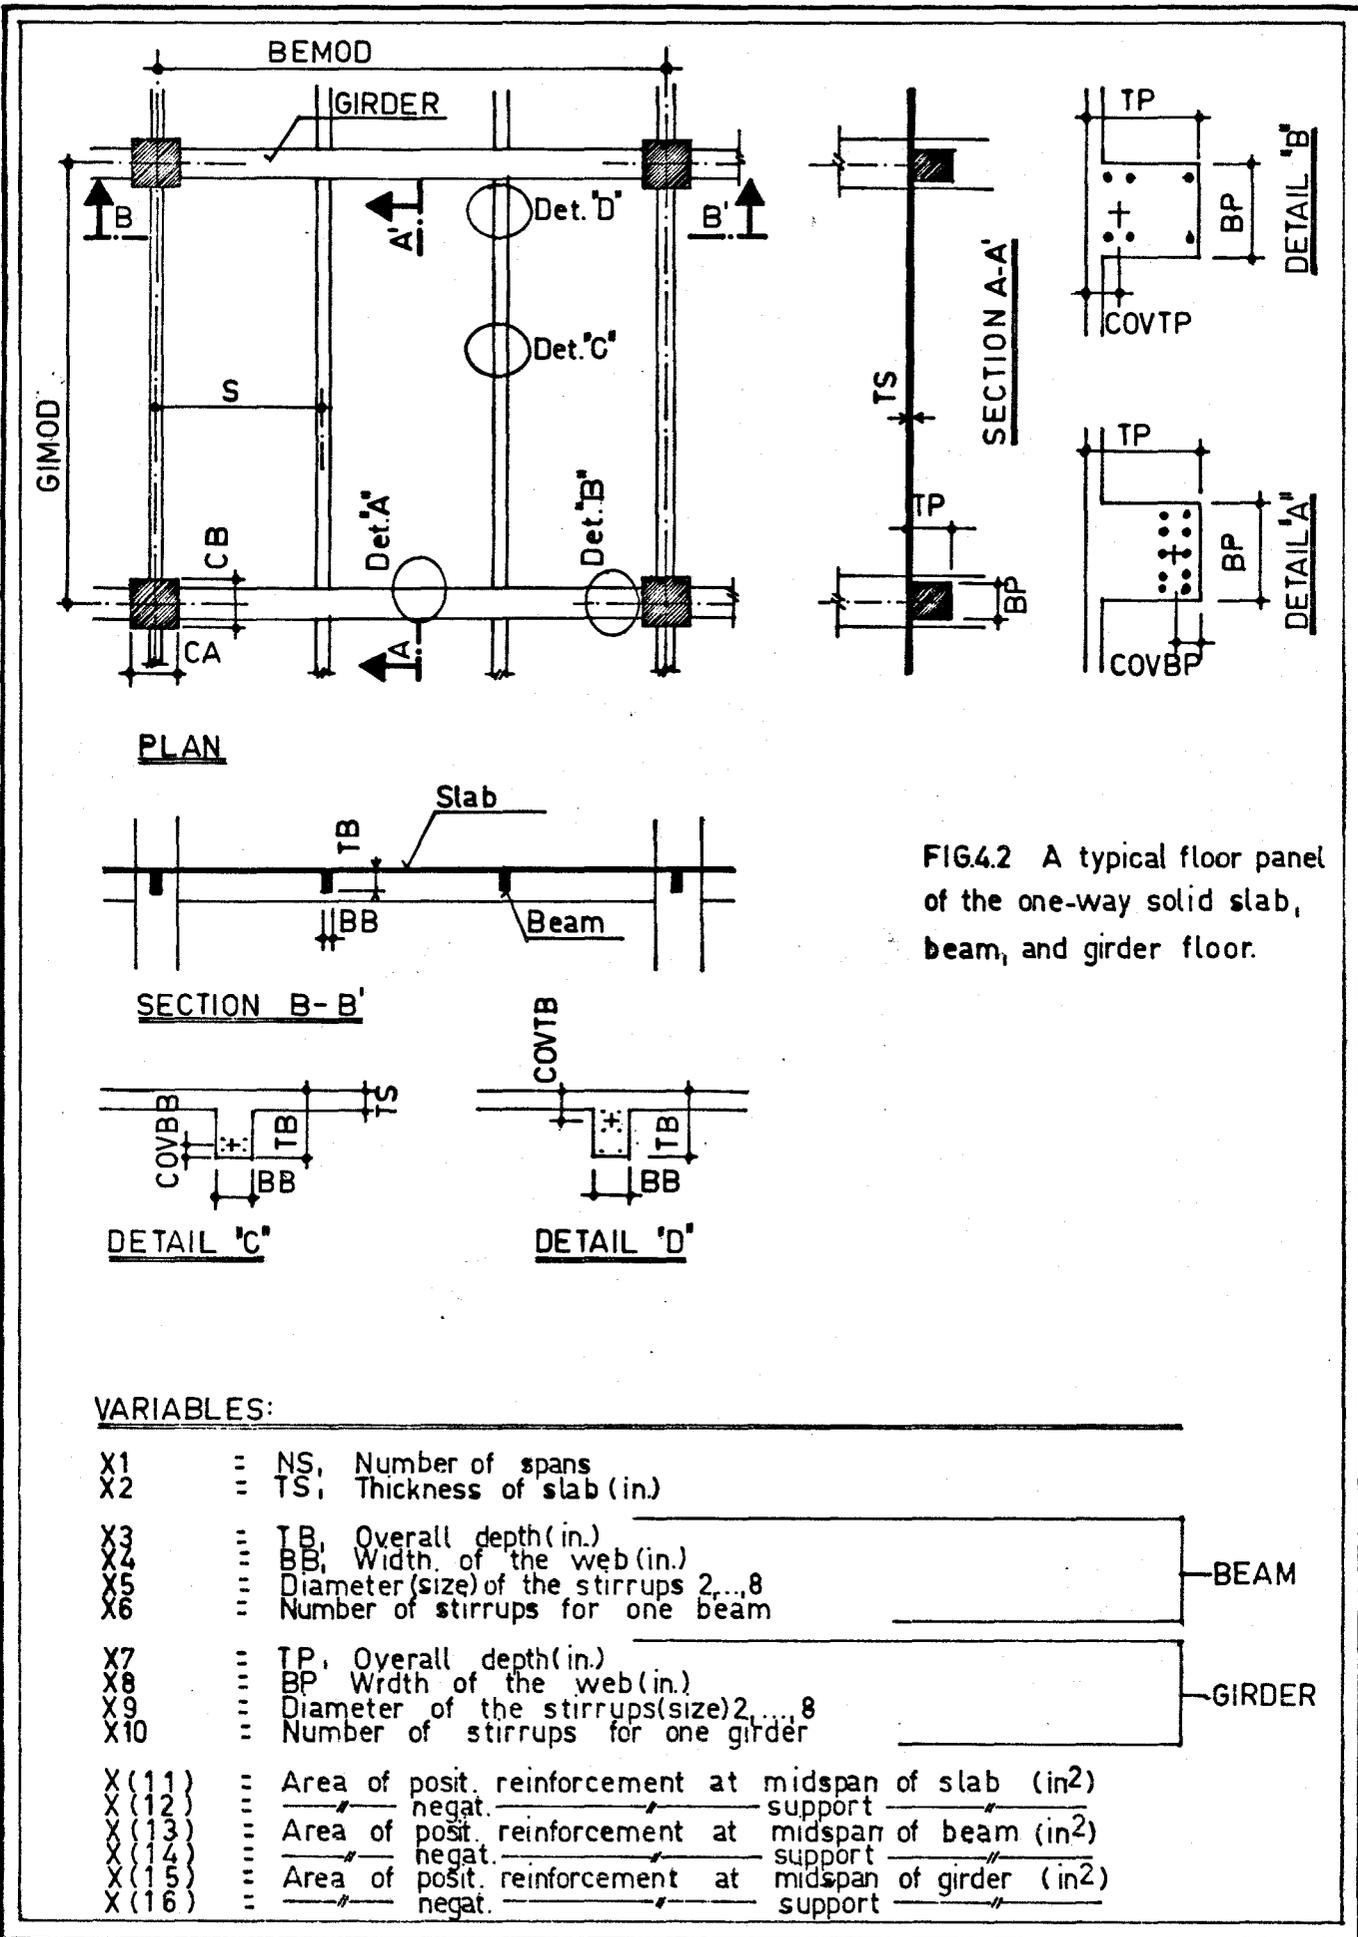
A typical floor panel of the one-way solid slab, beam, and girder floor.
